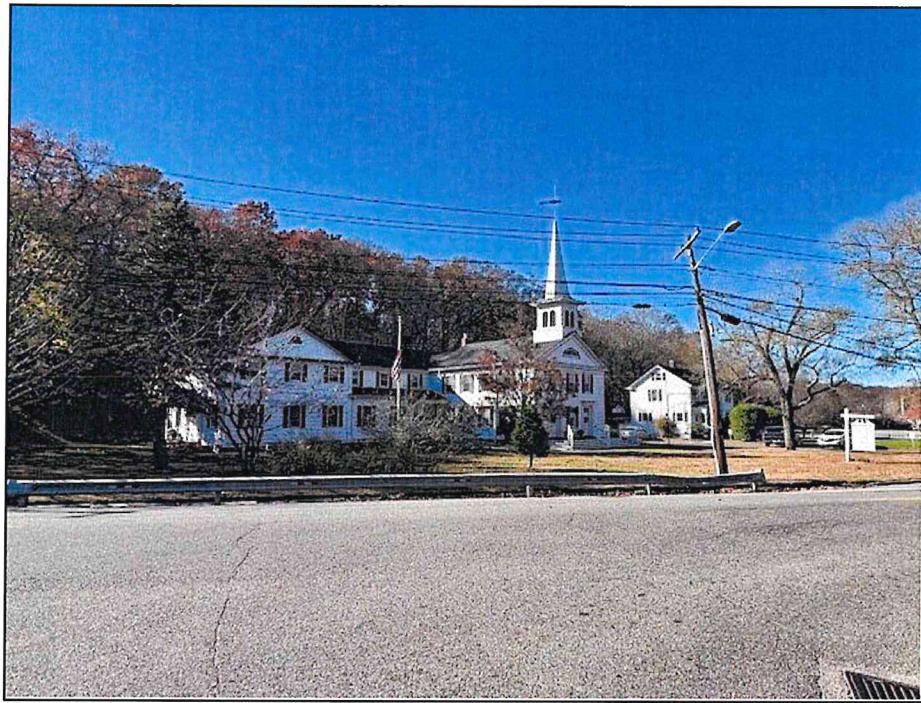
Proposed Location of Concealment Pole Behind Firehouse, Looking Northeast
